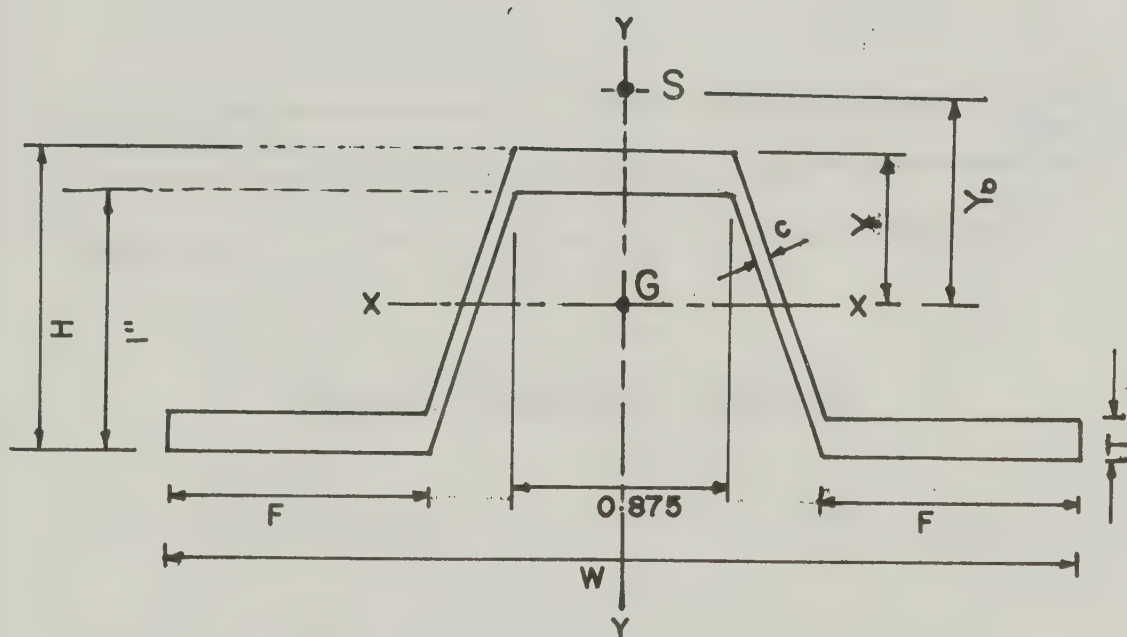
TYPE C - SHALLOW HAT SECTION
